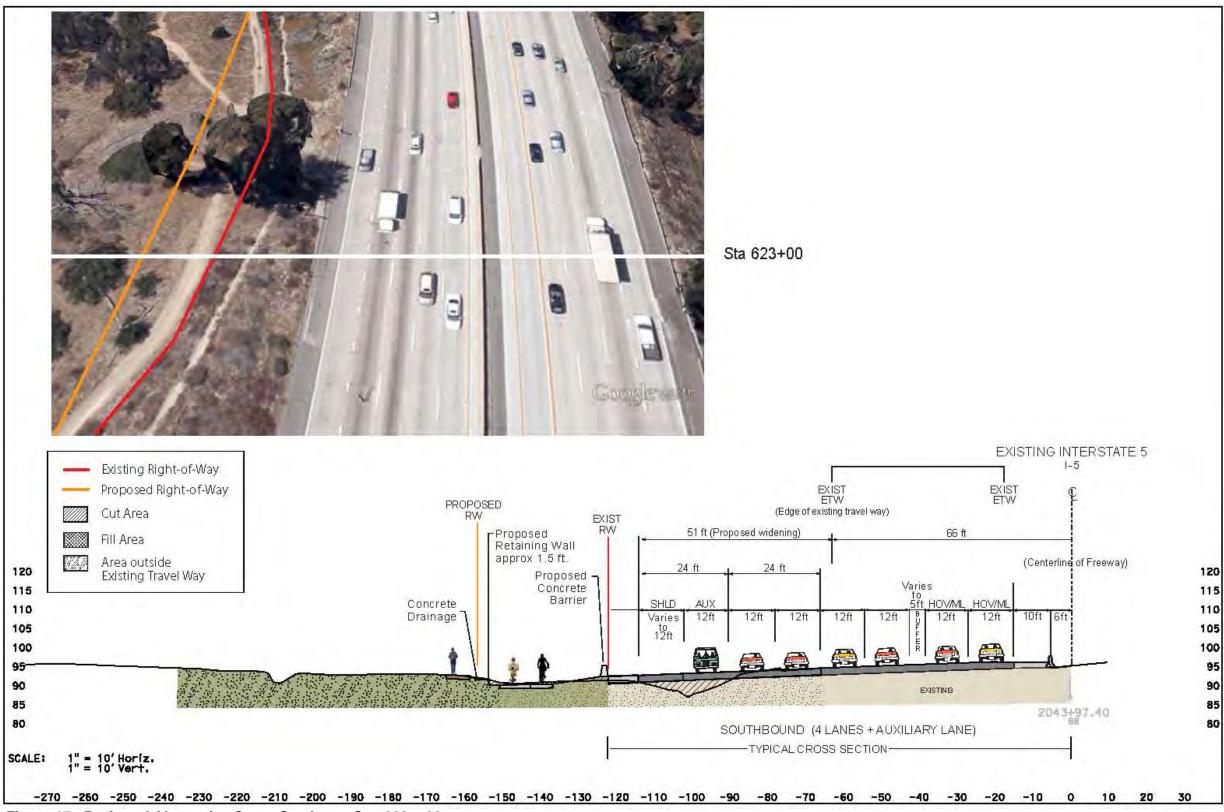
Preferred Alternative Cross Section at Sta. 623 + 00
